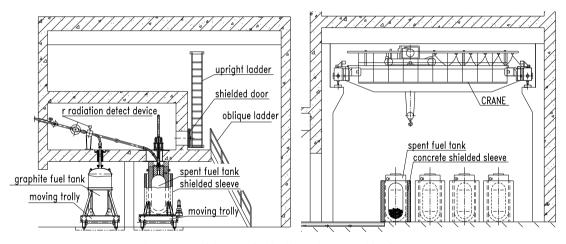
Layout of the spent fuel loading and storage cabin of HTR-10
